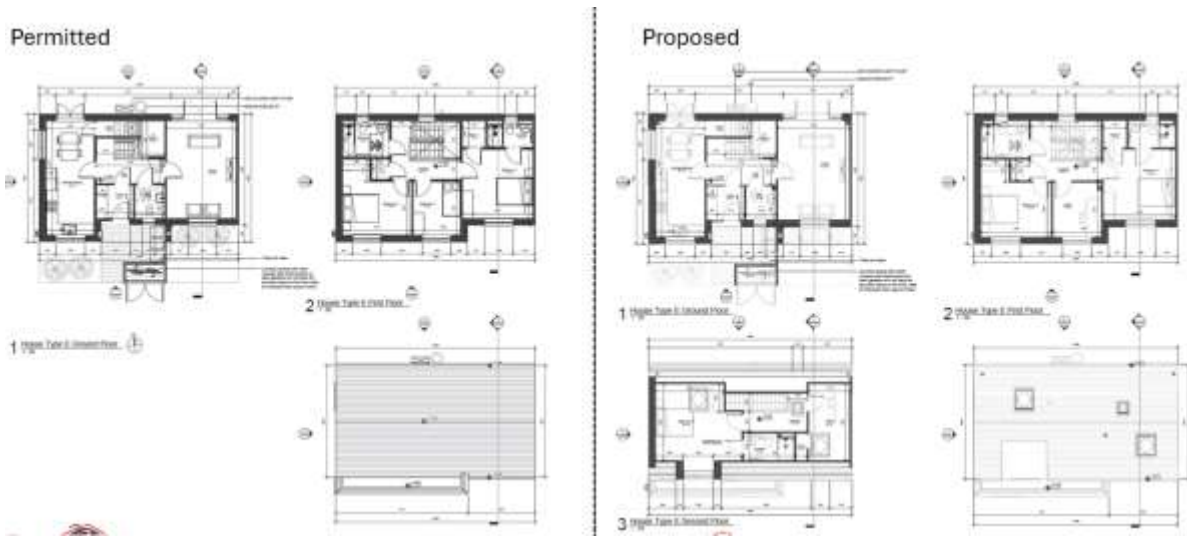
Previously Approved House Type E Floor Plans (left) and proposed House Type E Floor Plans (right)
